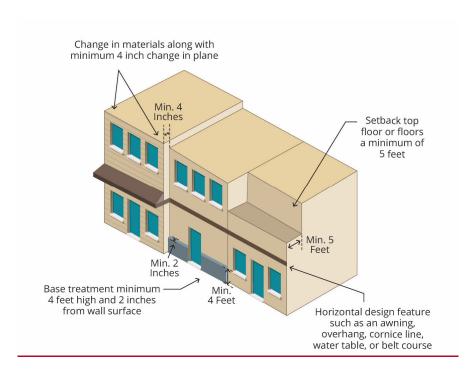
E MULTI-UNIT DWELLINGS, VERTICAL ARTICULATION
